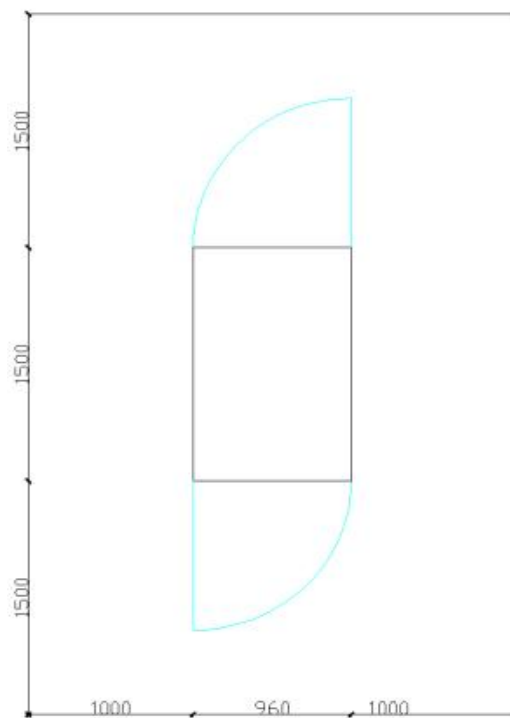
Schematic Diagram of Single Cabinet Installation Space Requirements (unit:mm)
